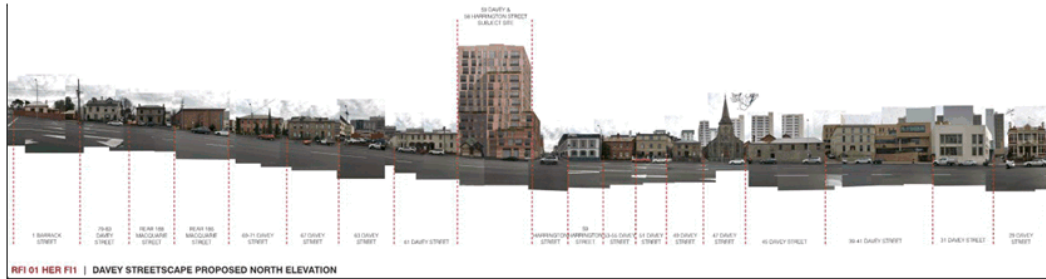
Streetscape elevation of the northern side of Davey Street, including the site and proposed development (provided by applicant).
